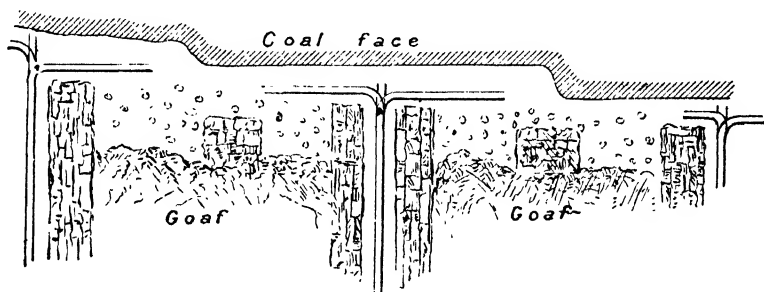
STONE PILLARING AND TIMBERING AT LONGWALL FACE.
